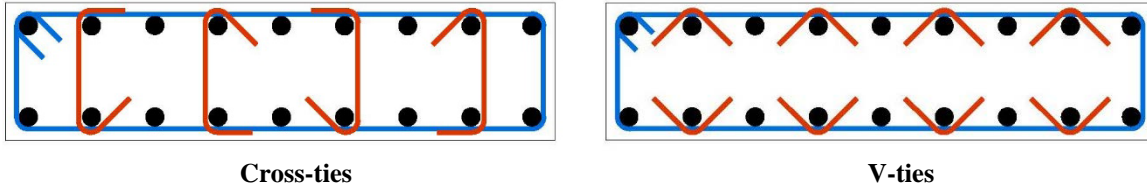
Details of transverse reinforcement for columns with cross-section (250 * 1000 mm).
